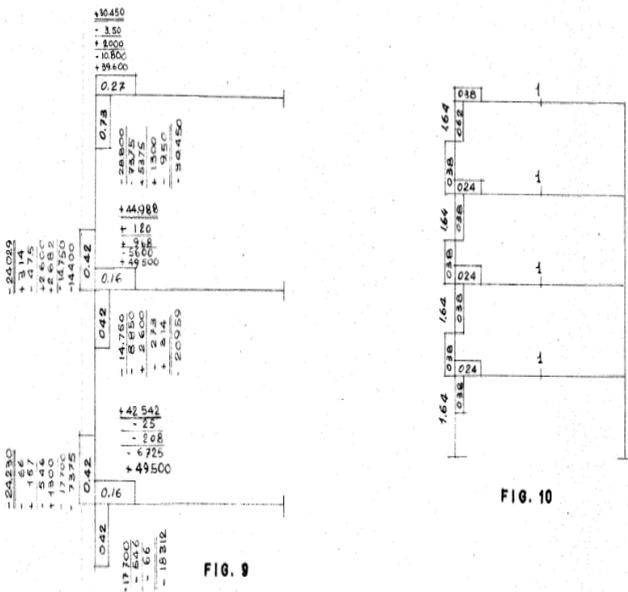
Example of a porticoed structure calculation. Pavilions of the Barcelona Superior Technical College of Industrial Engineers [10].
